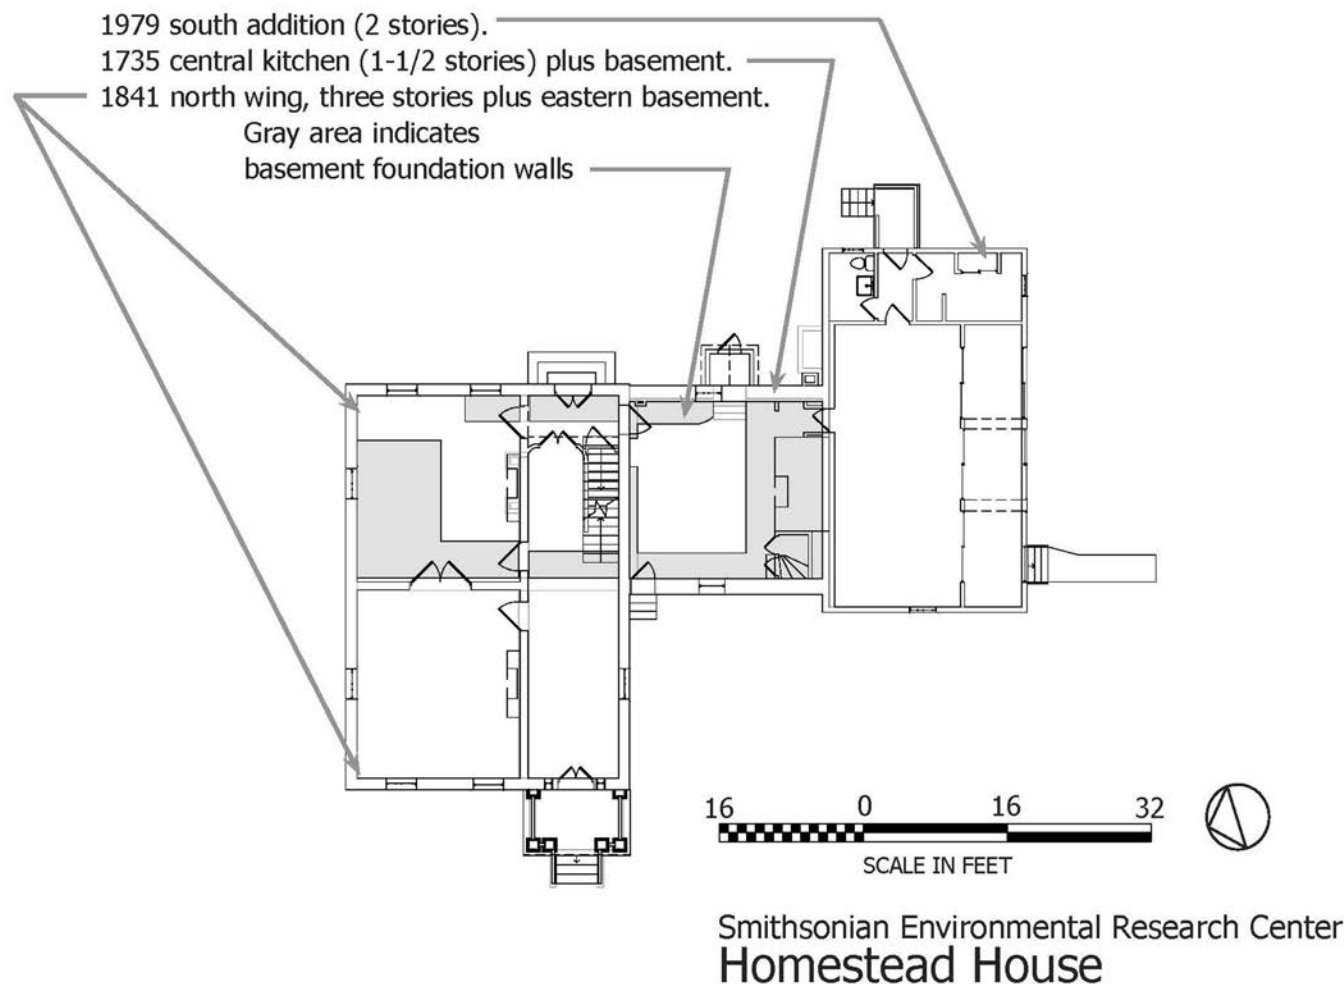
The plan of the first floor is superimposed on the existing basement foundation, shown with shading. The 1841 section sits only partially on the early foundations, which was of concern regarding its structural loading capacity. (Drawing by GWWO, Inc./Architects.)
